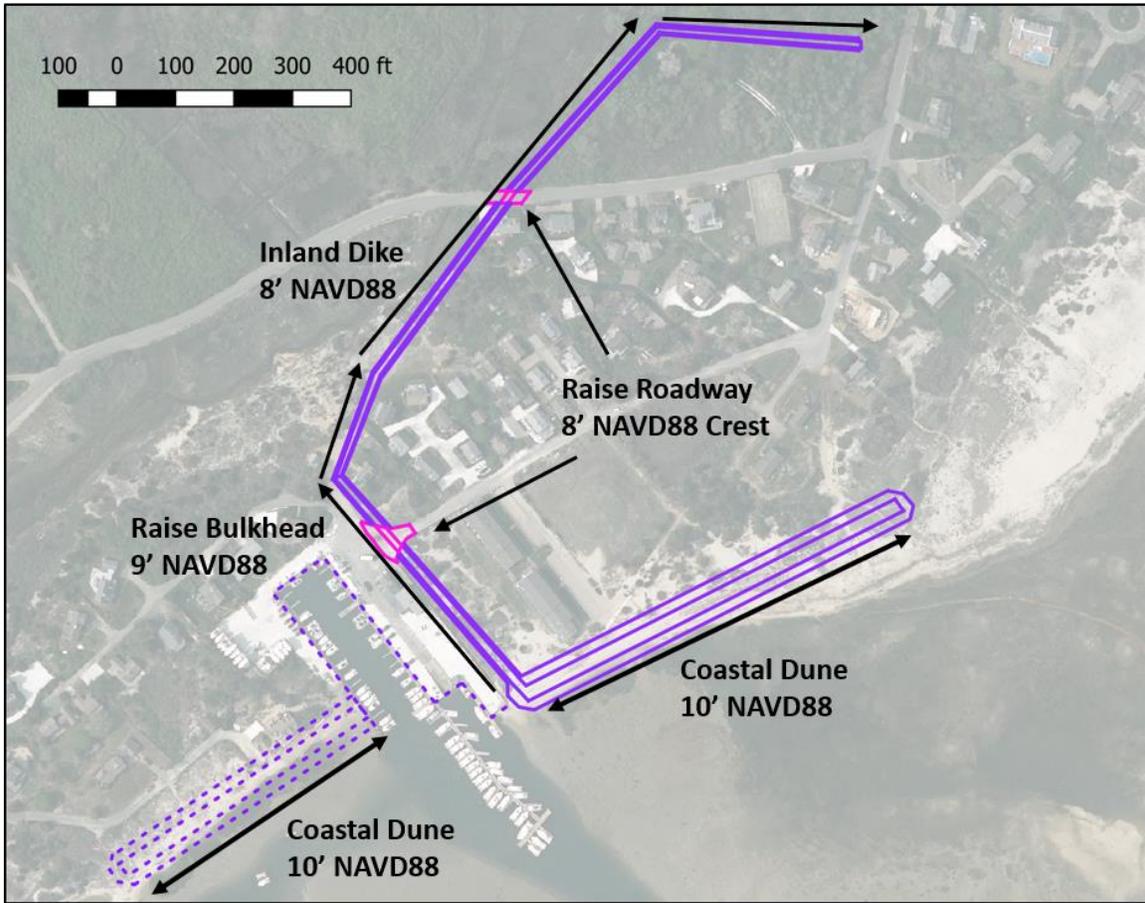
An alternative dune/berm/flood wall protection concept, where redundant protection is provided for the area north of Outermost Harbor Marina.
